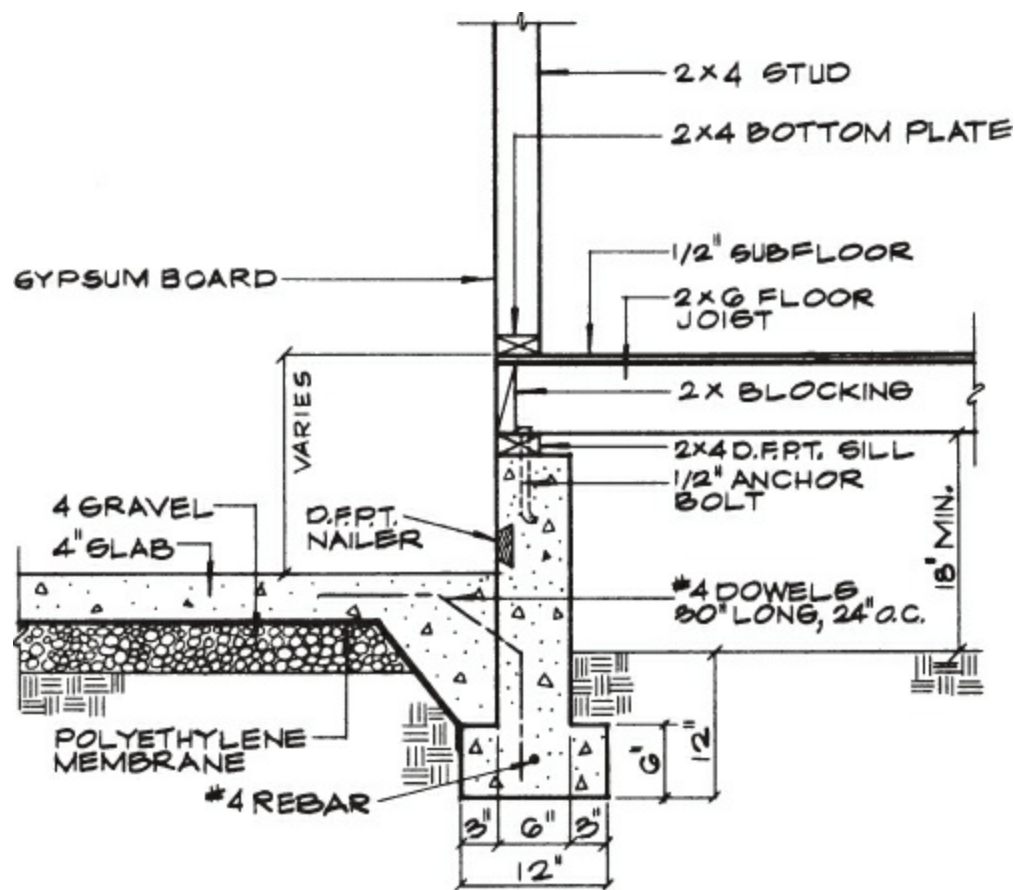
Concrete...block foundation wall supporting a wood floor.
